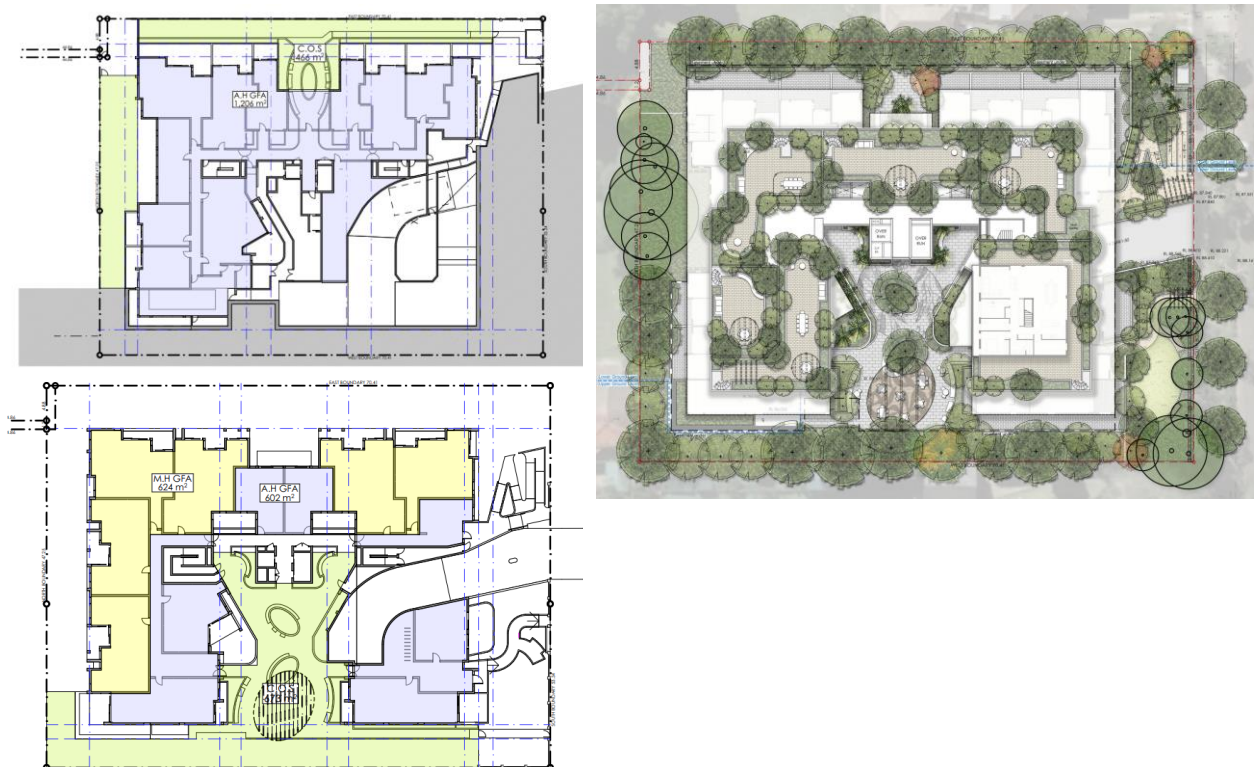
The lower and upper ground floor plans highlighting in green where the COS is located, many of which is not useable as shown on the Landscape Composite Masterplan
